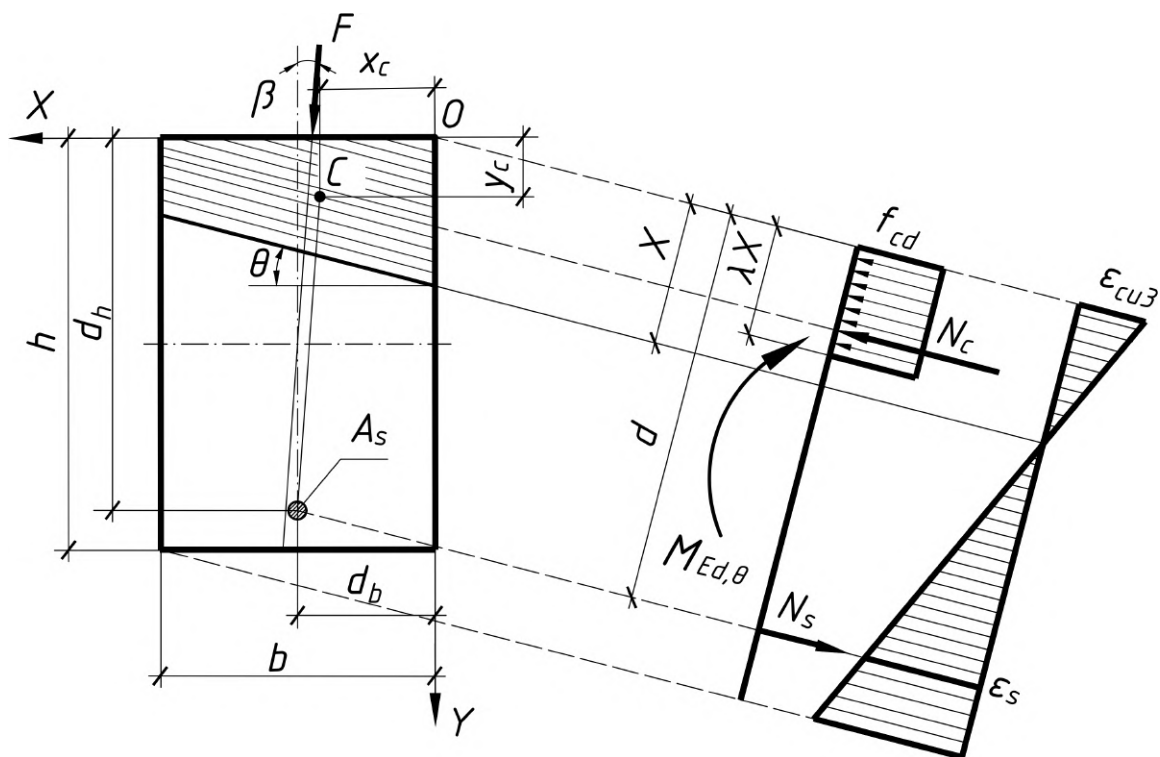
Design diagram of the cross-section of a biaxially bended member with a trapezoidal form of a compressed concrete area.
